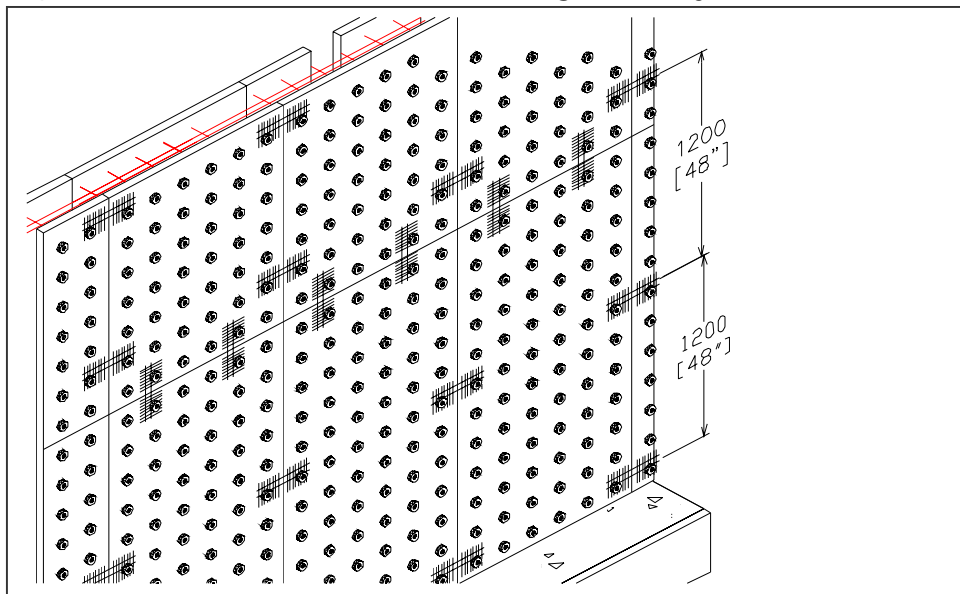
Detail of installation of the Armopanel™ Connecting Mesh
